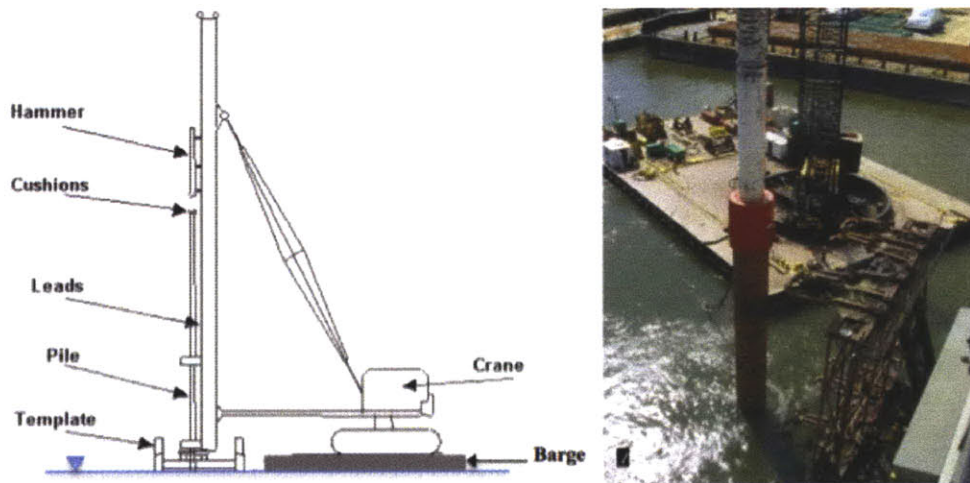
Left – Sketch of pile driving and necessary components, adapted from (Lee, 2009); Right – Pile being driven offshore by use of a template and pile extension, (Roadtraffic-technology.com).
